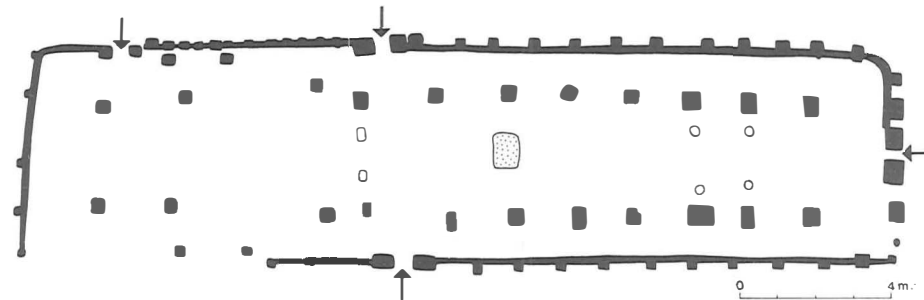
House plan from Fochteloo. Excavated in 1935.
